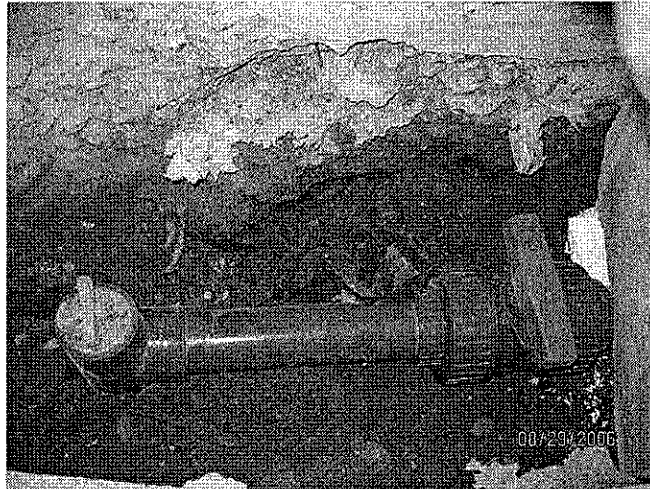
AS-1 riser connected w\TEE to Sch80 2" PVC pipe connecting to a ball valve
